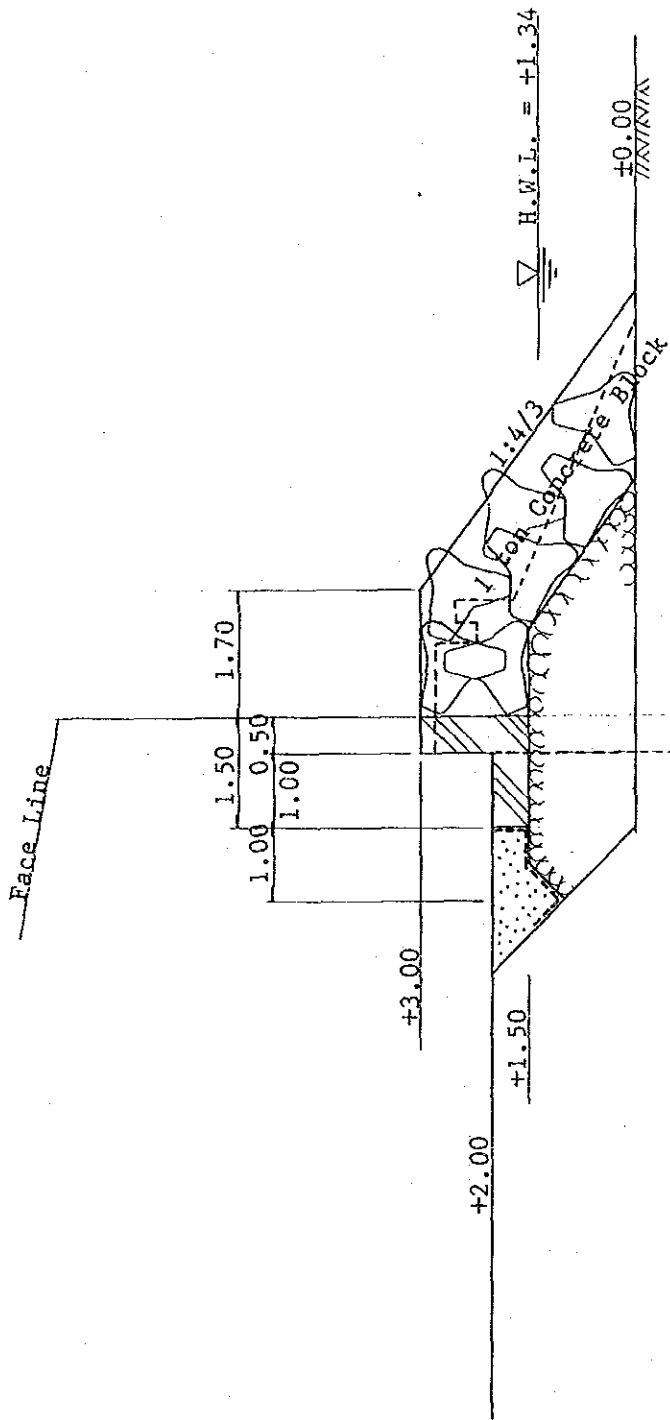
Typical Section of East Coast : South Seawall (S=1:100)
